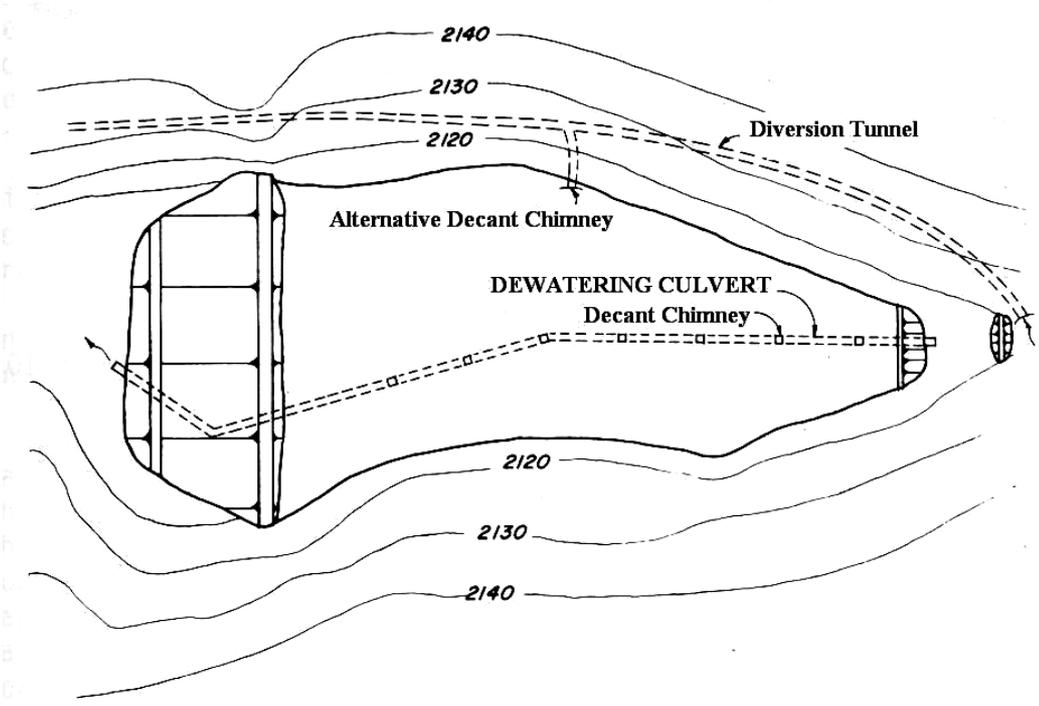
Plan view of tailing deposit (Smith and Connell, 1979)
